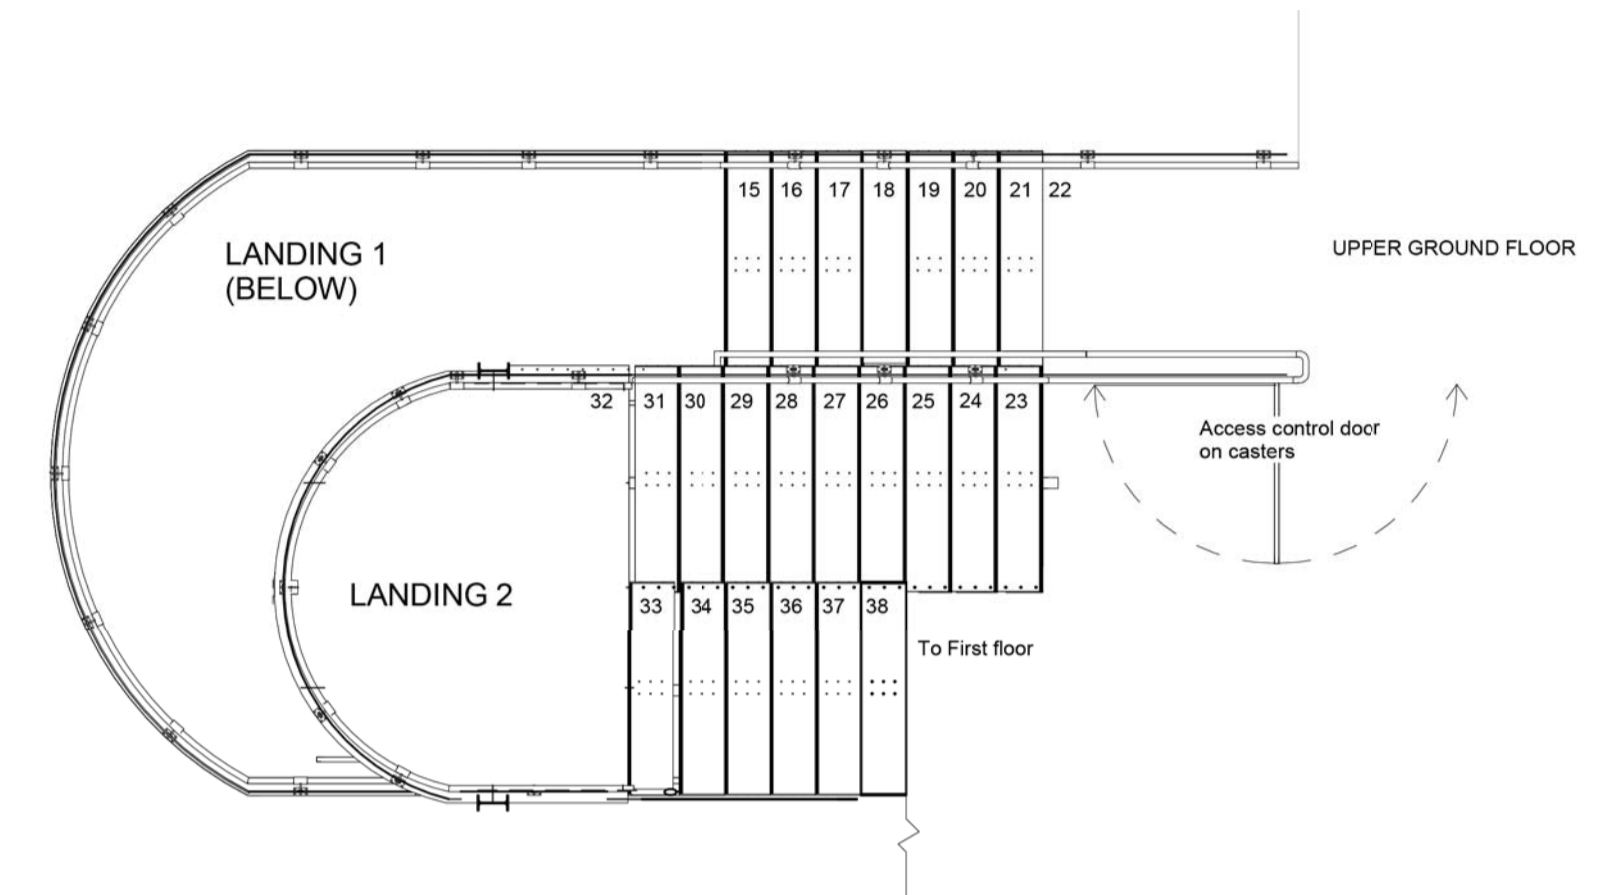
LANDING 2 PLAN SCALE 1:50
